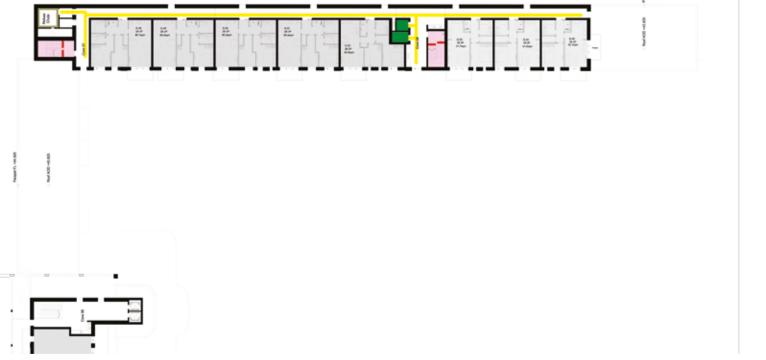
Block G General Arrangement - Fourth floor
